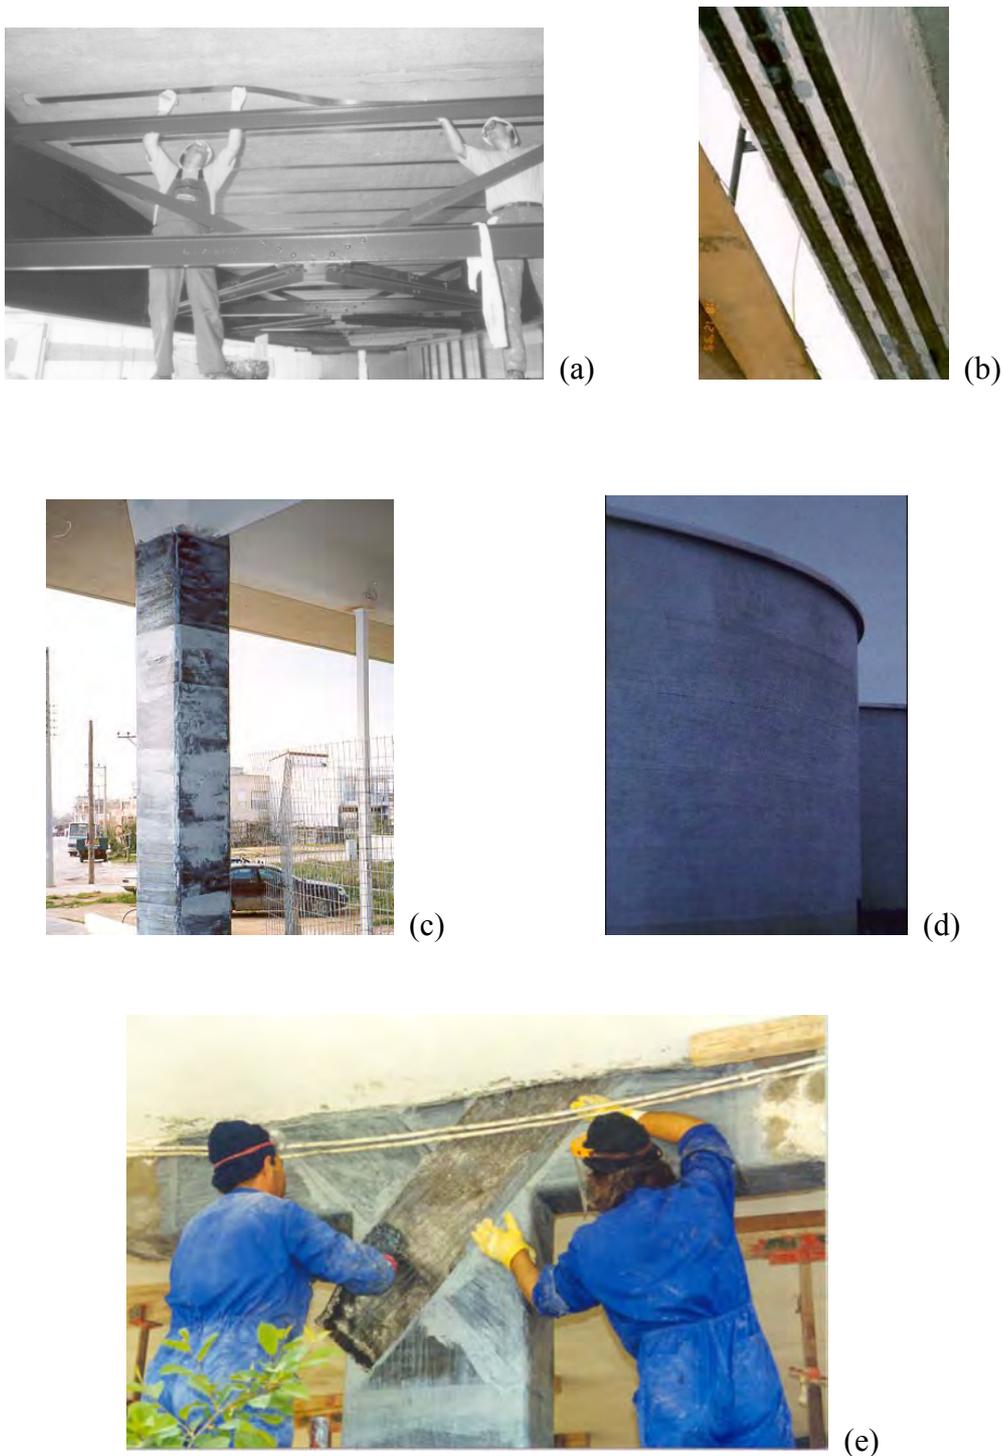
Typical FRP applications as strengthening materials of RC structures: (a) flexural strengthening of slab; (b) flexural strengthening of beam; (c) shear strengthening and confinement of column; (d) wrapping of concrete tank; (e) shear strengthening of beam-column joint.
